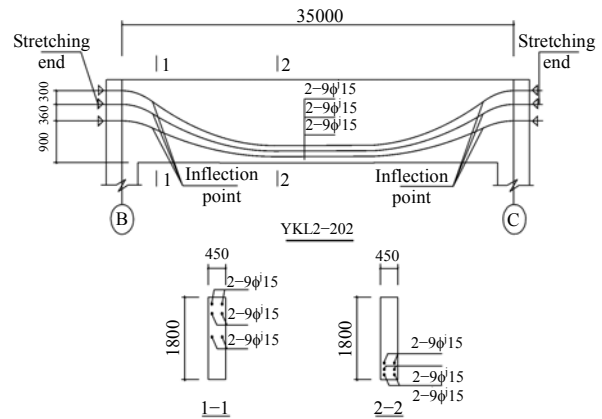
Configuration of the typical interior prestressed reinforced concrete beam
